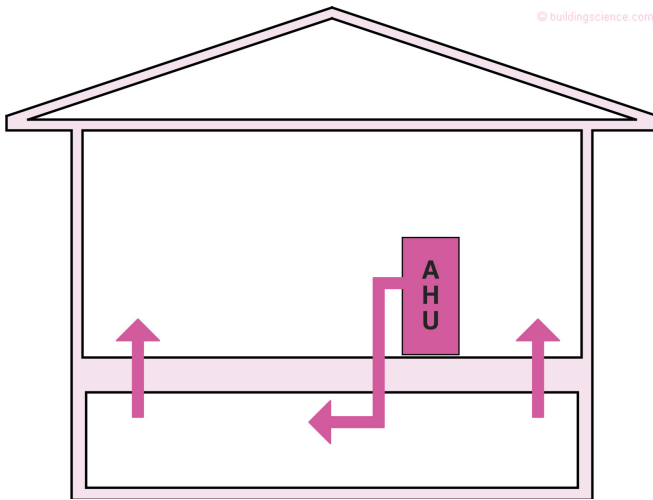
Supply Air to Crawlspace - When you supply air to the crawlspace from an air conditioner or furnace there needs to be a way for air to come back to the house...besides poor workmanship. A transfer grille is recommended.
